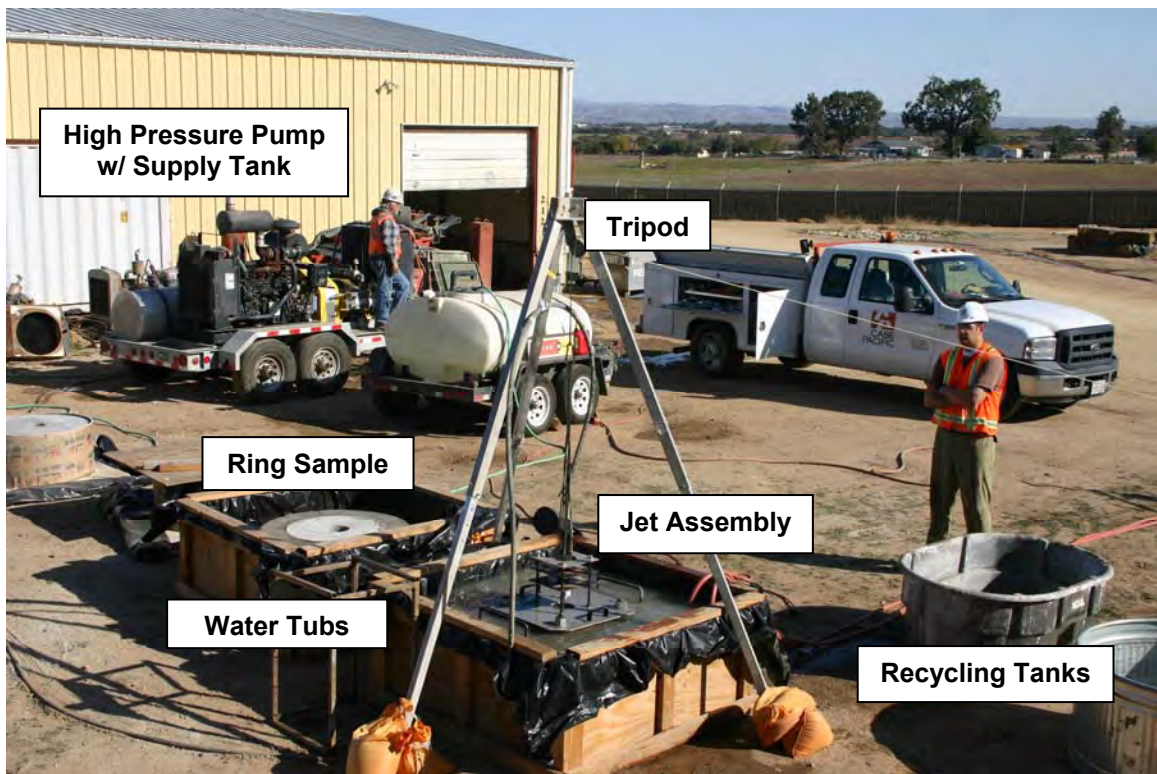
Photograph Showing the Water Jetting Test Equipment and Layout
